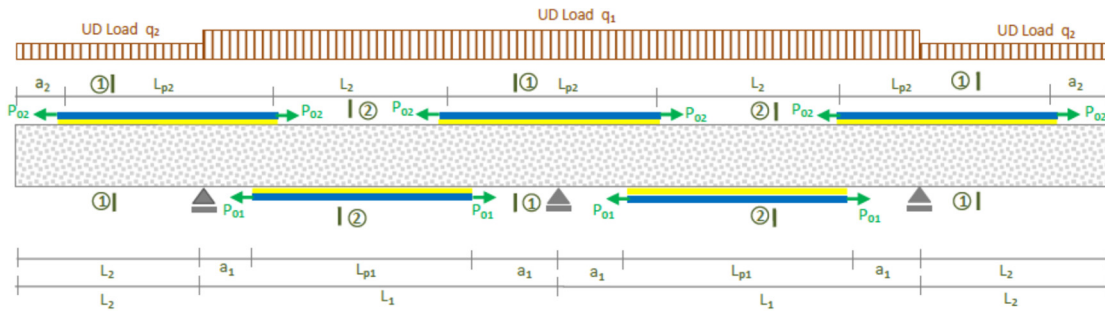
Continuous RC beam bonded by a prestressed composite plate
